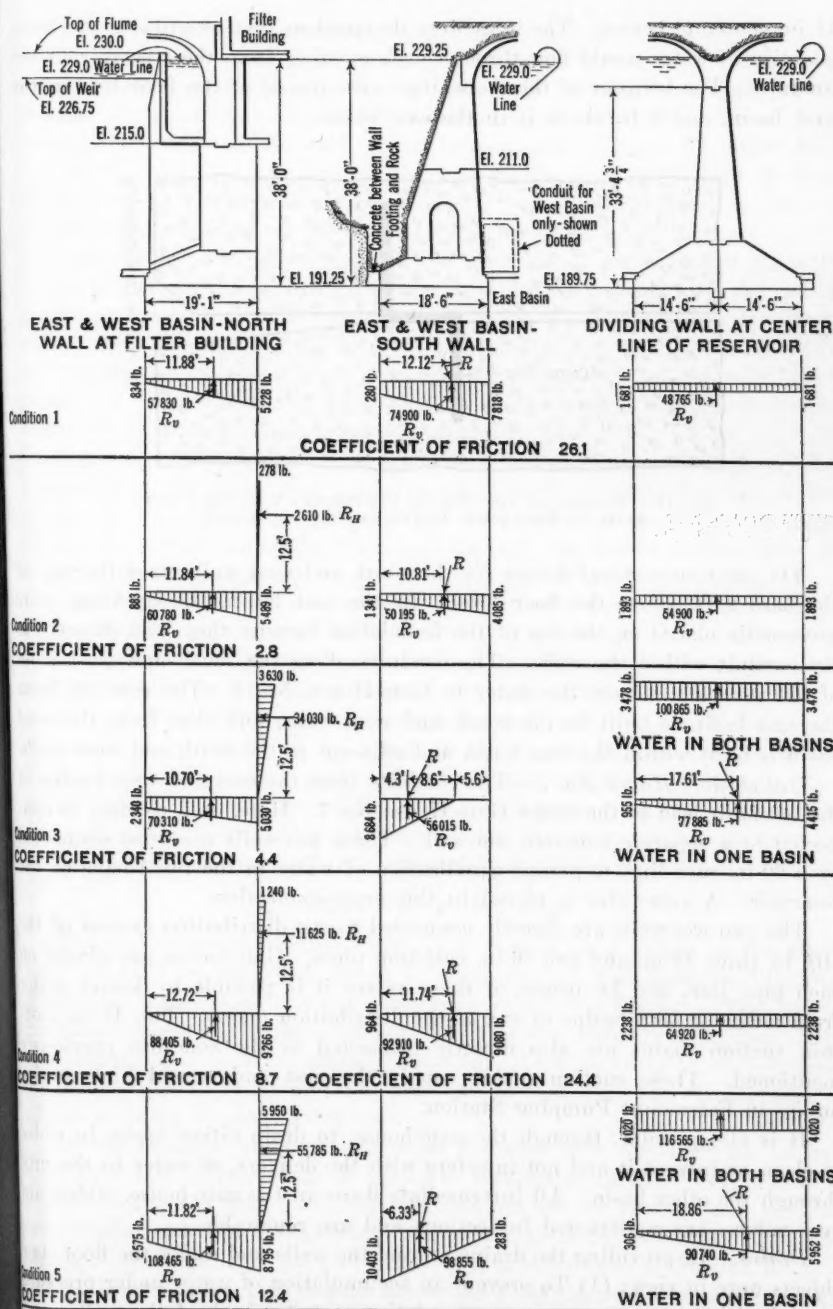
OUTLINE OF WALLS AND DISTRIBUTION OF FOUNDATION LOADS.
